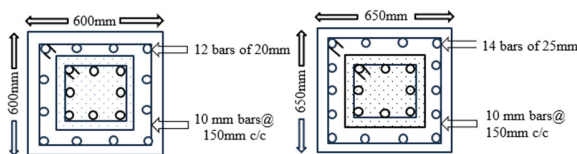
Details of column jacketing reinforcement layout of external and internal column, respectively.
